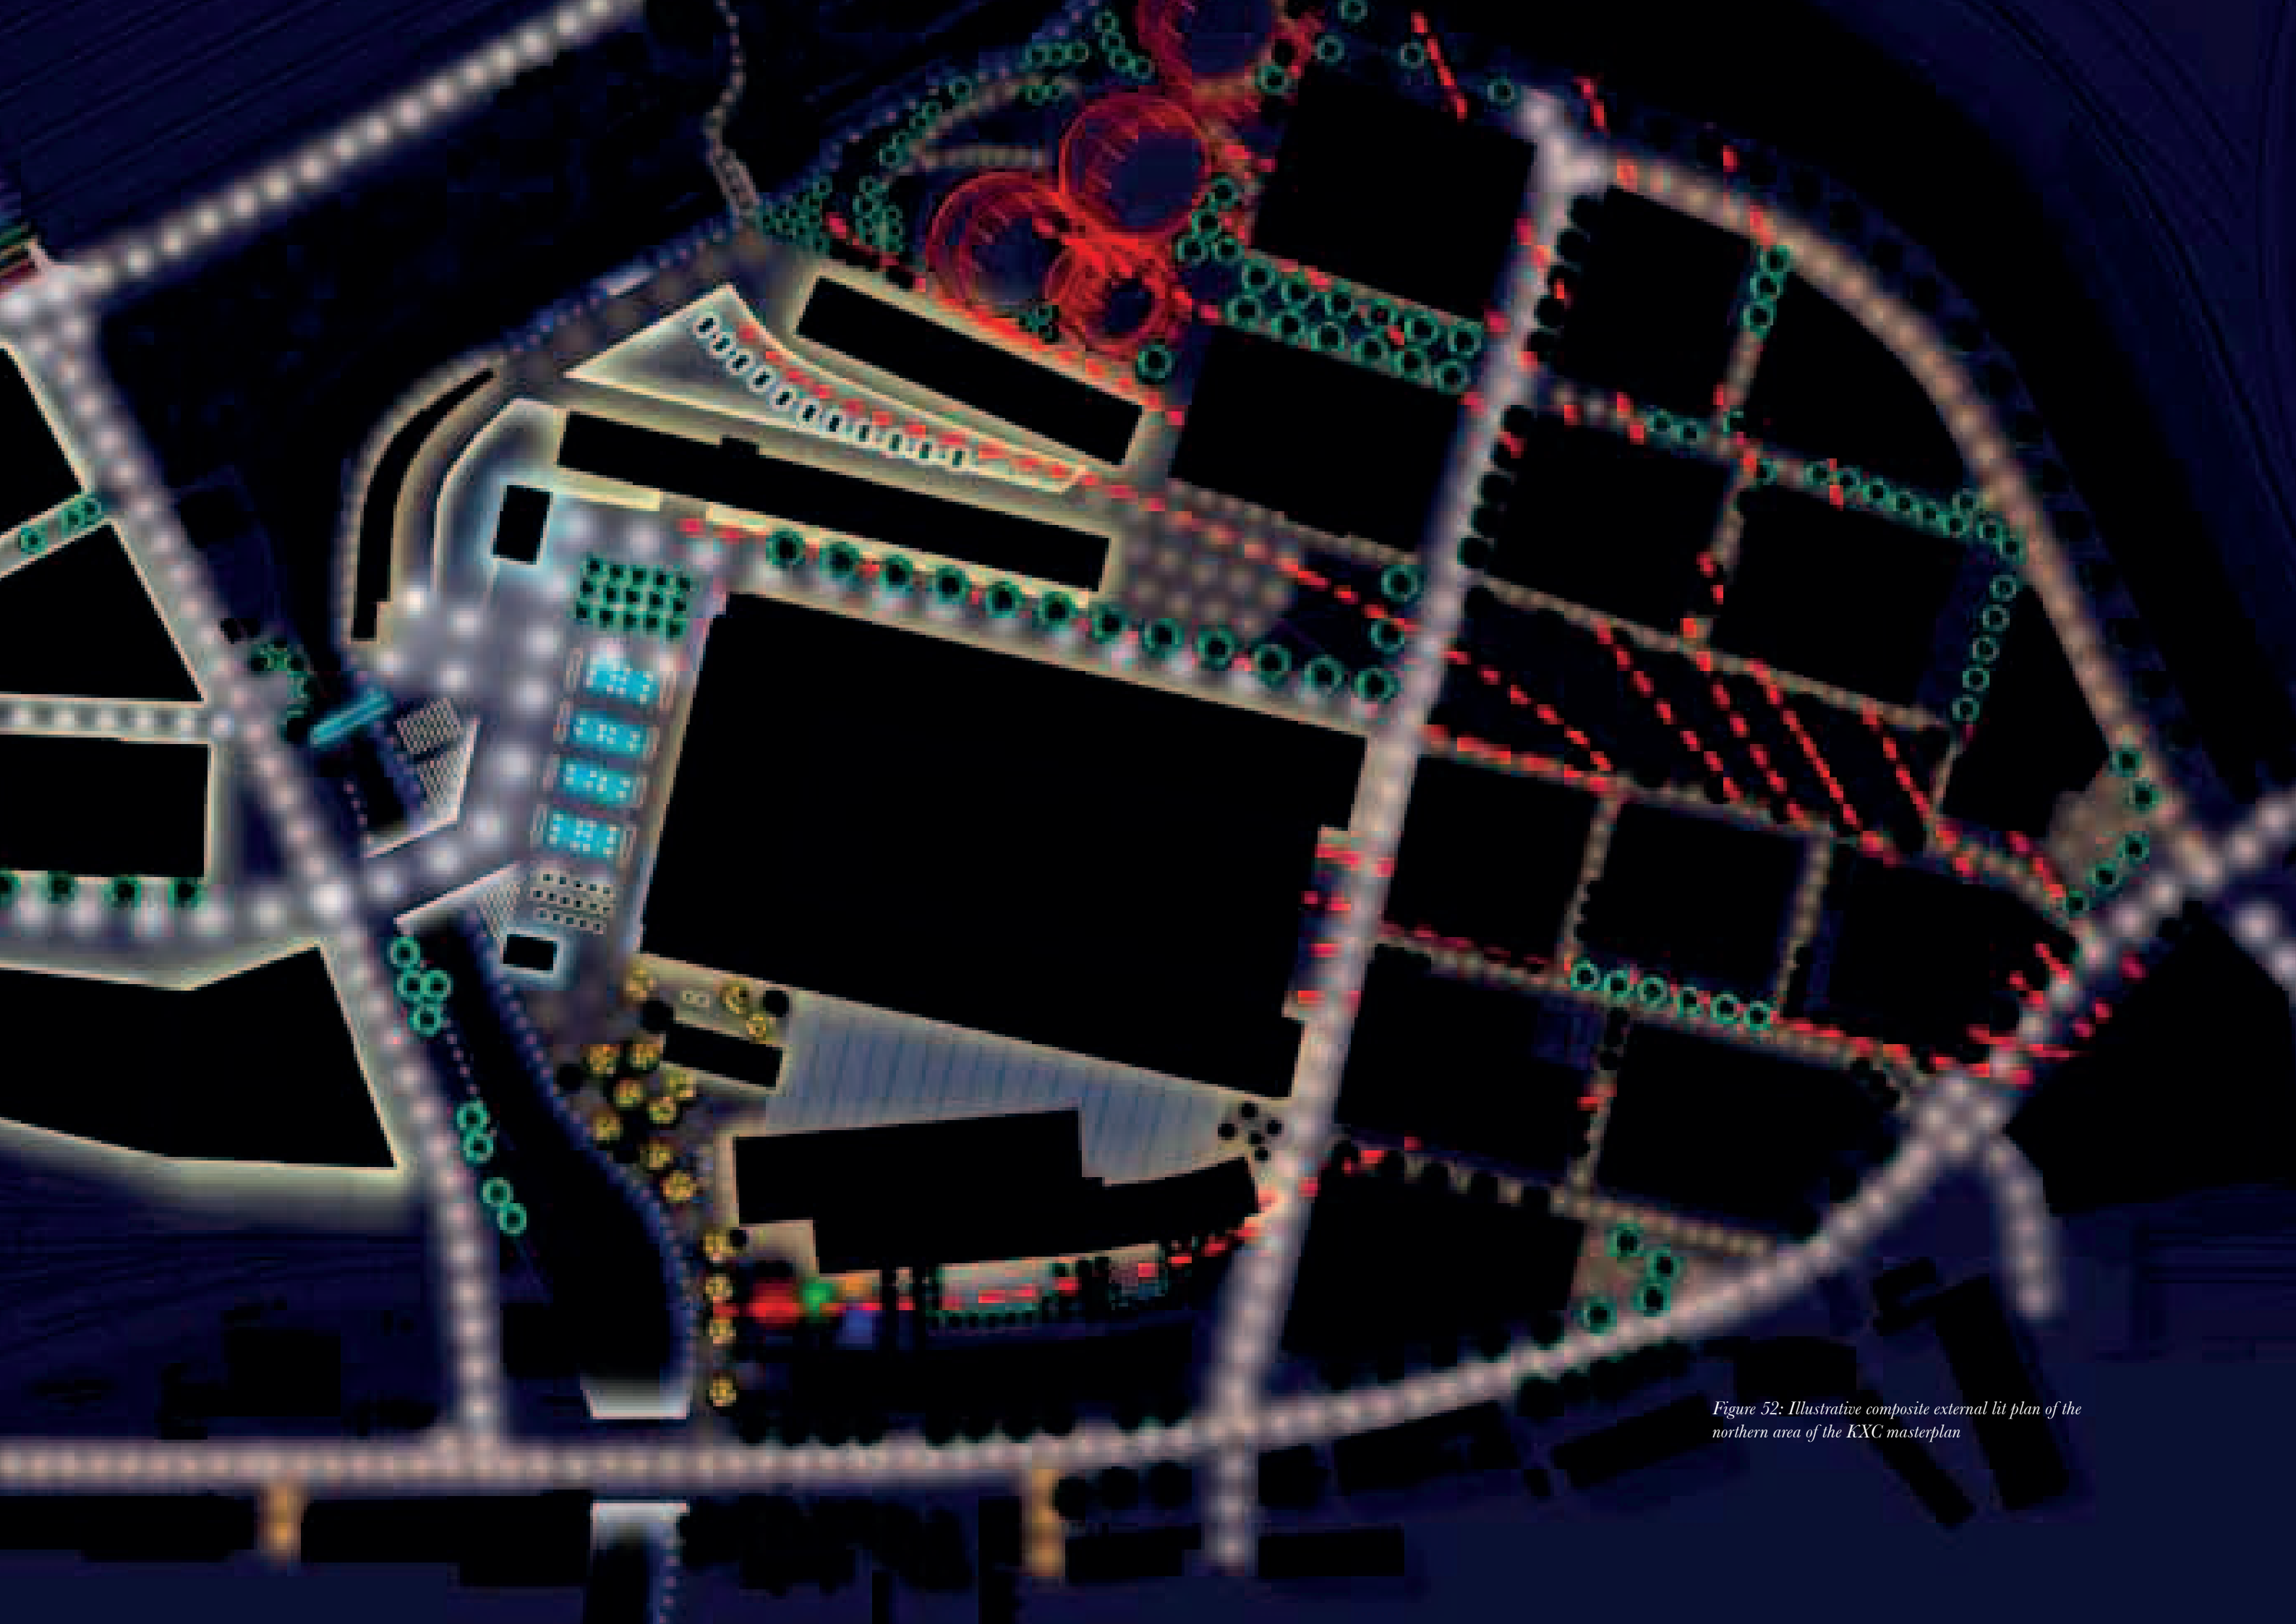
Illustrative composite external lit plan of the northern area of the KXC masterplan
